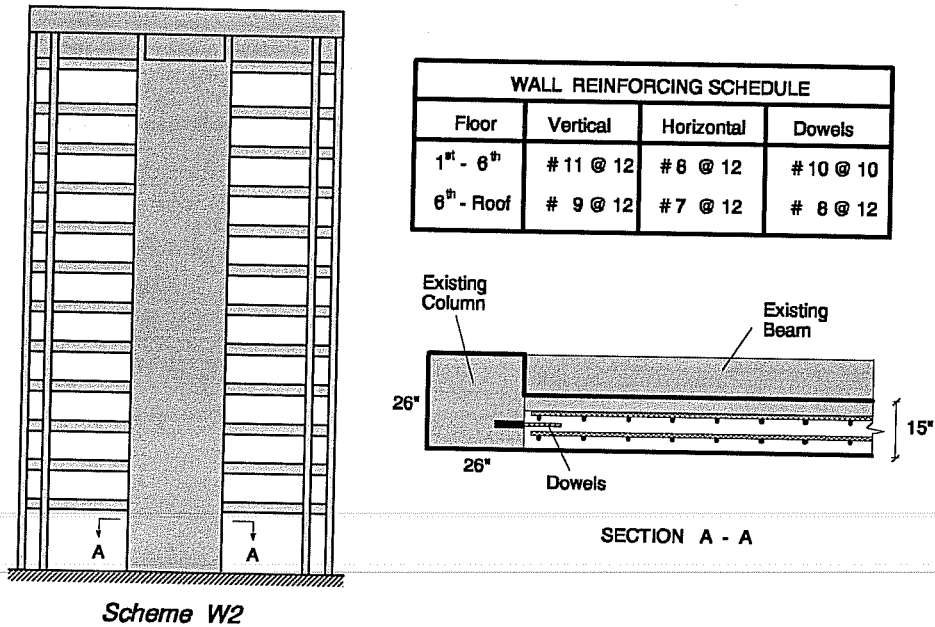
Cross section and reinforcing details of structural wall scheme W2 for the twelve-story building.
